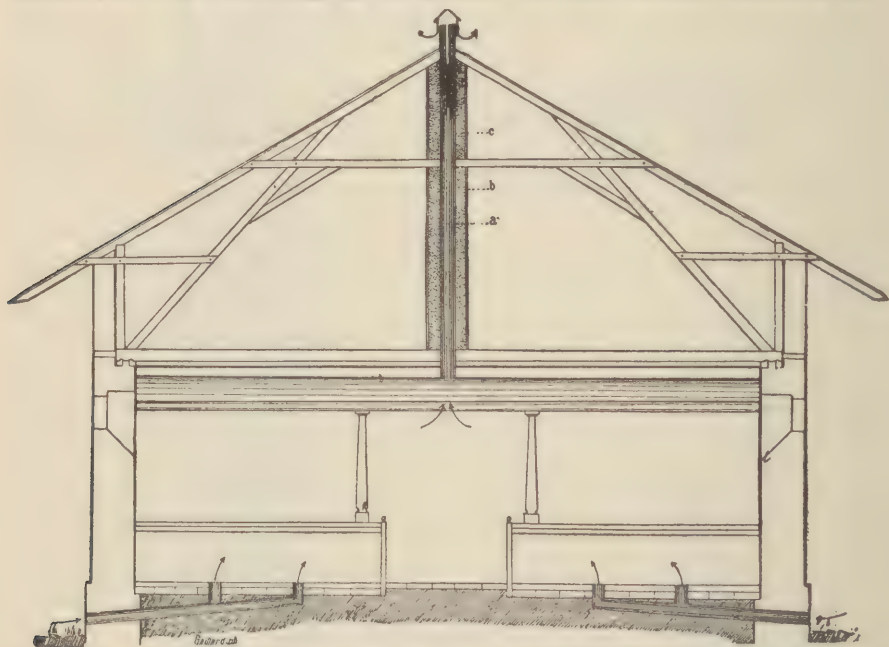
Vertical section of a stable, with floor ventilation and ceiling aeration.
